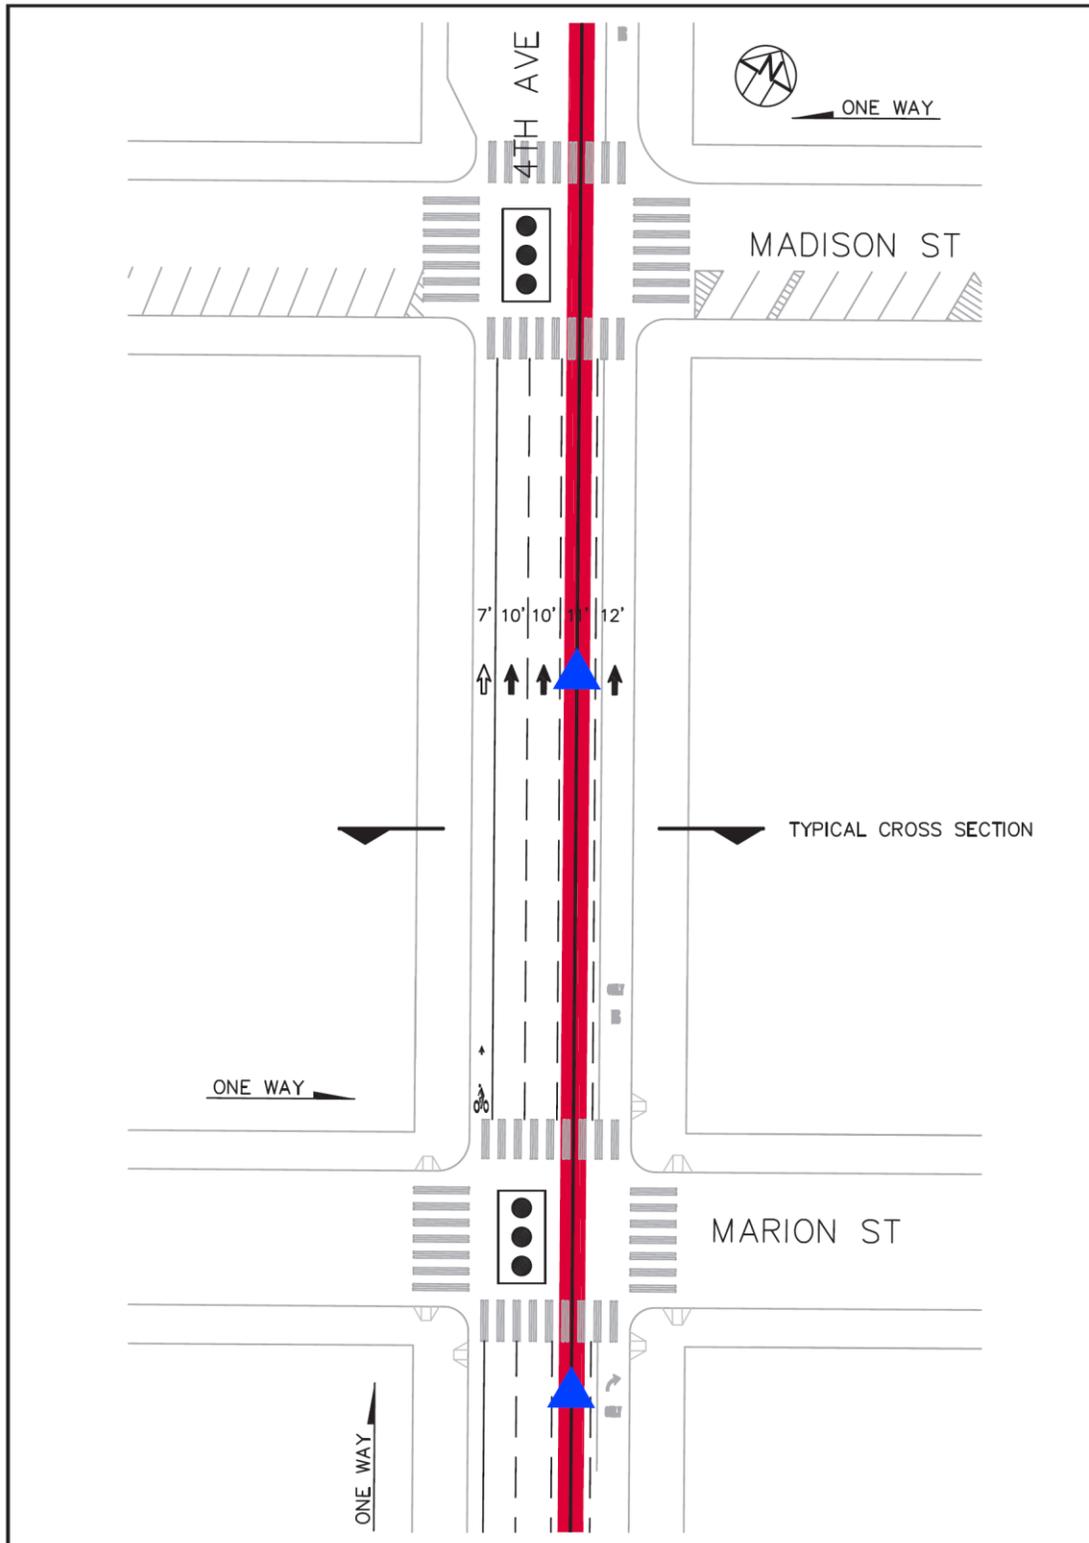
and Figure 2-13 illustrate a typical 4th Avenue cross-section and streetcar operations between stations.
